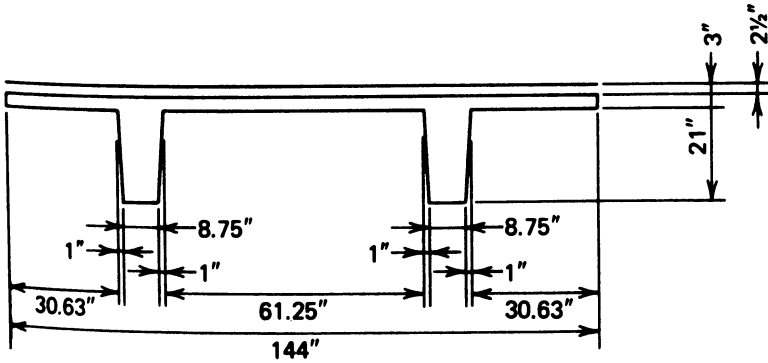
Cross section of double-tee beam used in I.P. 9-16.
